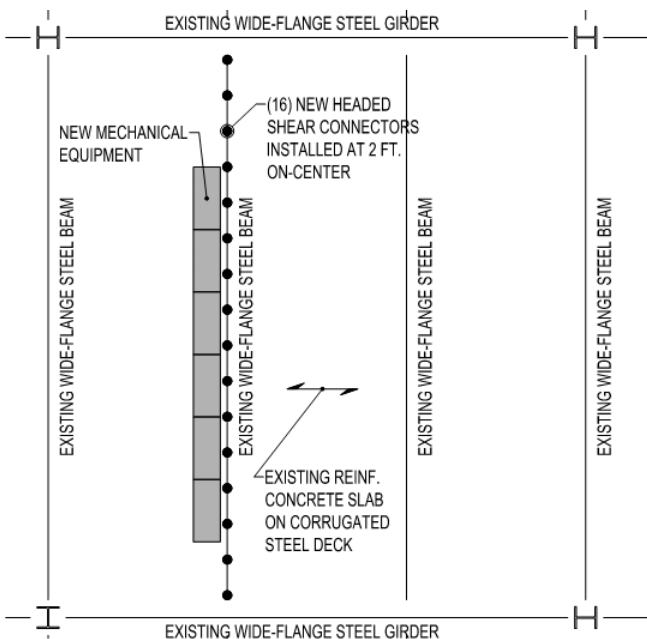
Floor framing plan, illustrating new headed shear connector strengthening.
